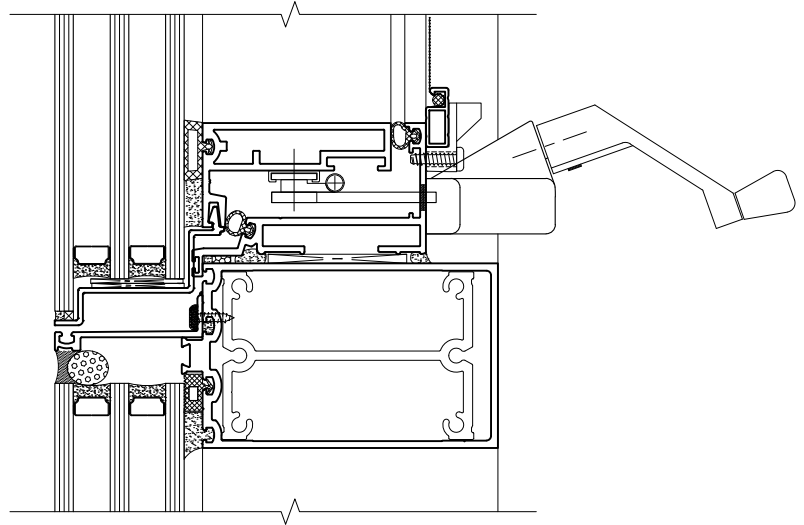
DETAILS SHOWING PROJECT OUT PHANTOM VENT WINDOW INSTALLED INTO THERMAWALL 2600
